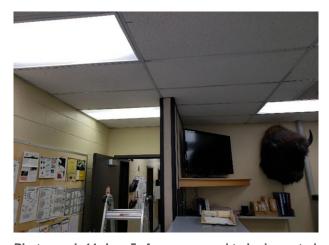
Loc 2; Area proposed to be impacted by renovation work
